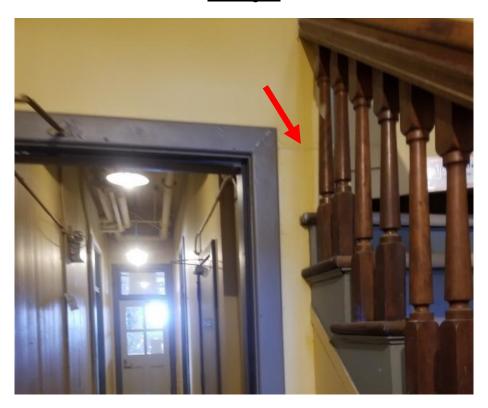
Ground floor, corridor/vestibule, <1 square metre fair condition drywall joint compound to the right of the door next to stairwell.
